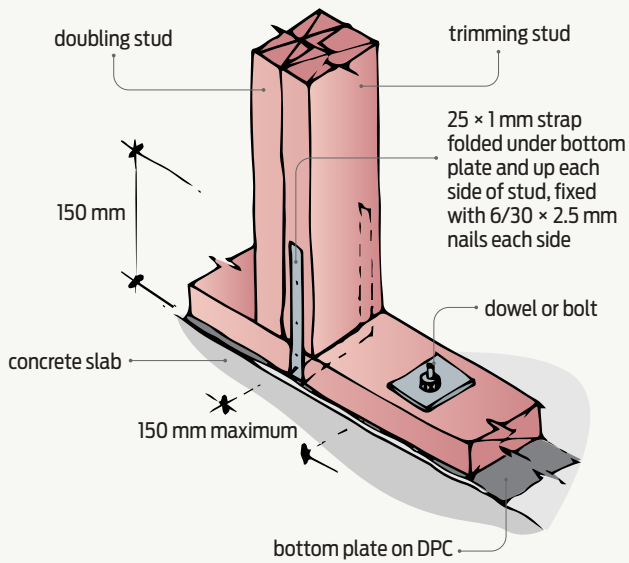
Fixing trimming stud and bottom plate to concrete slab.
